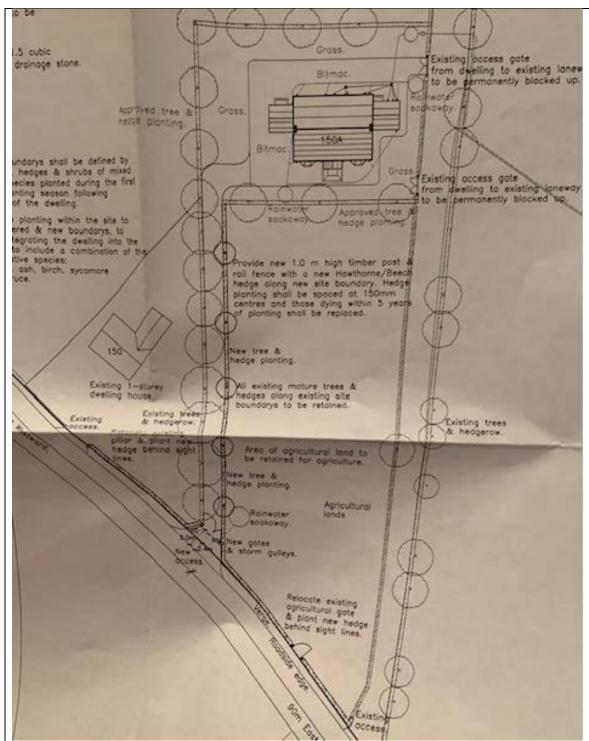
Block plan granted under planning application I/2007/0593/F showing land to front of dwelling to be retained for agriculture.
